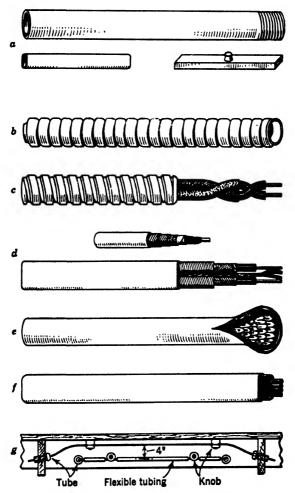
Conduits and raceways: (a) rigid steel conduit, oval steel raceway, and square steel raceway; (b) flexible steel conduit; (c) flexible armored duplex wire or "B-X"; (d) 1-conductor and 2-conductor lead sheath cables; (c) flexible lume (nonmetallic, fire-resisting); (f) clip-type raceway or "wire-moulding"; (g) knob-and-tube wire system.
